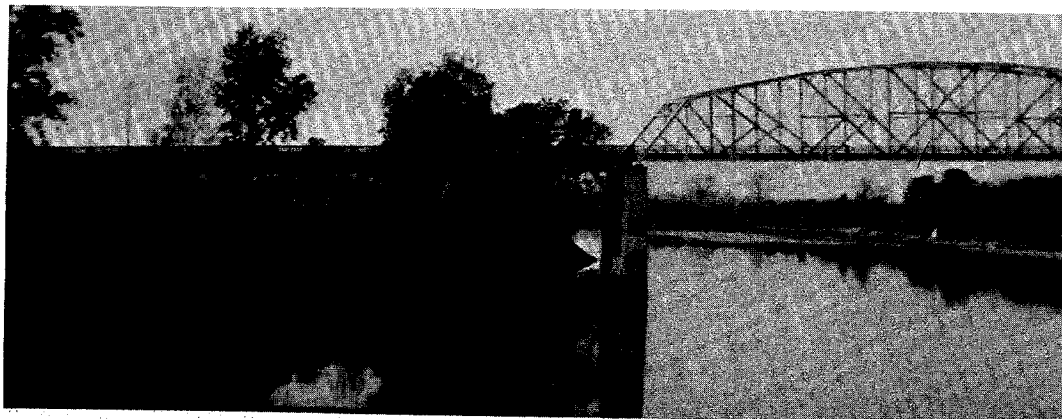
Downstream view of pier at left bank, US-82 bridge, in April, 1976. Pier was 210 ft from streambank at time of bridge construction.
